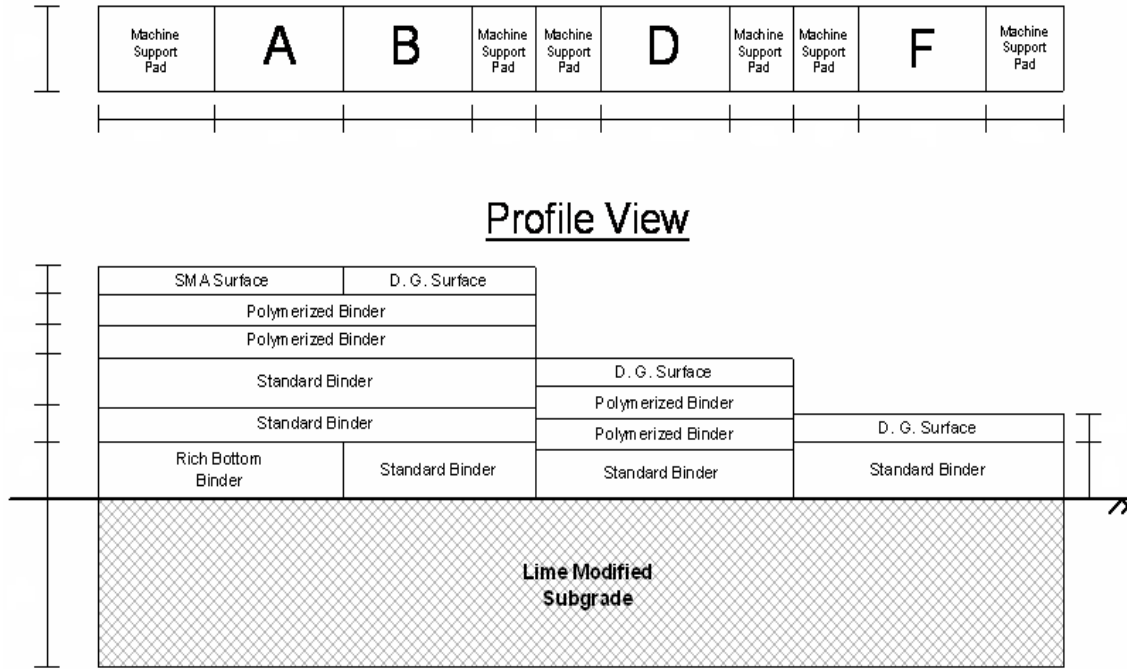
General layout of the full-depth HMA pavement test sections.
